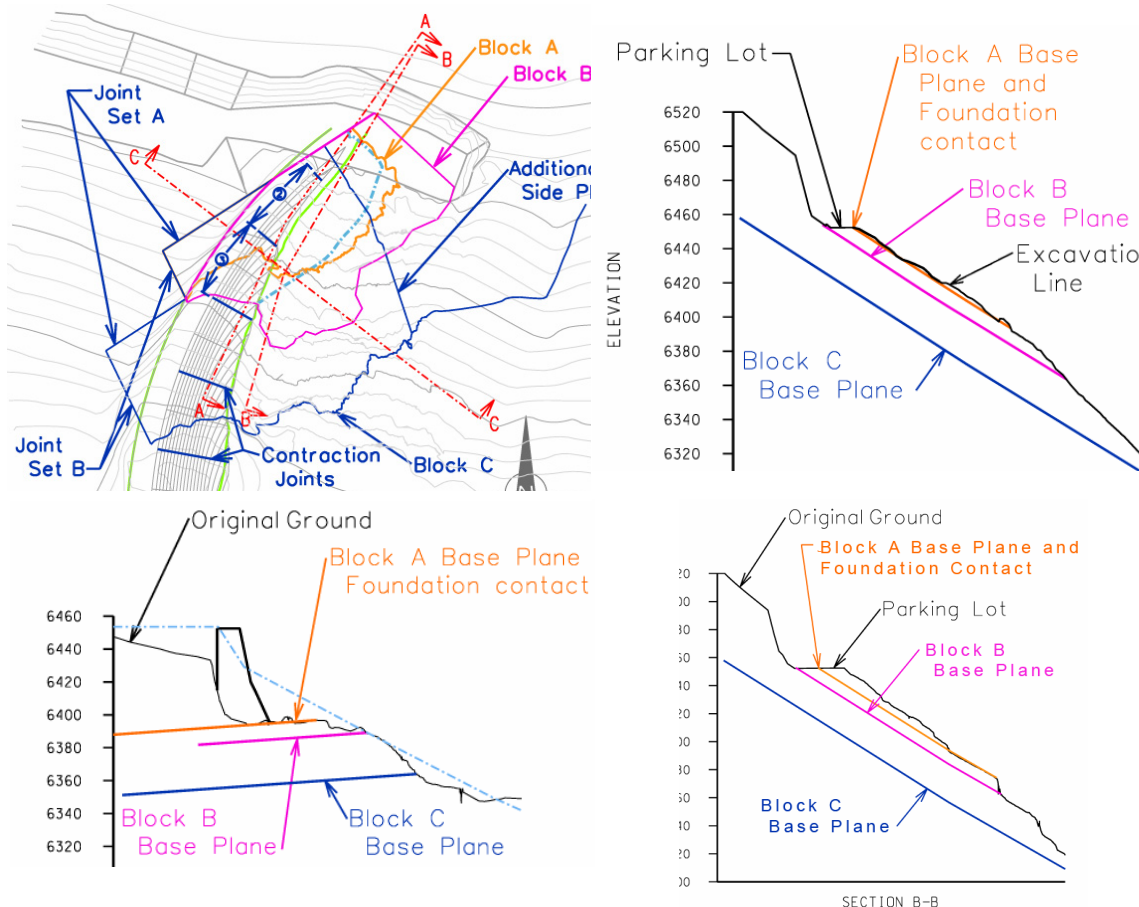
Anchor Dam Left Abutment Plan and Sections.
